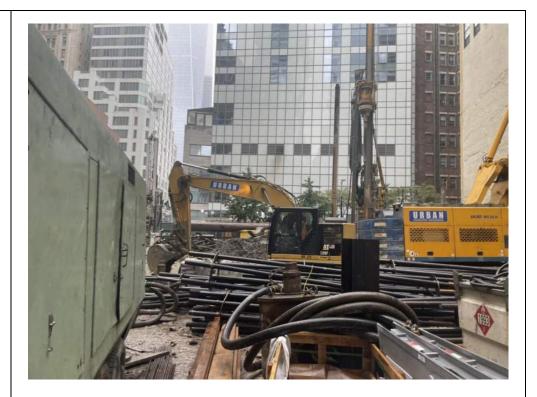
View of Urban replacing the geotextile fabric (facing northeast).
